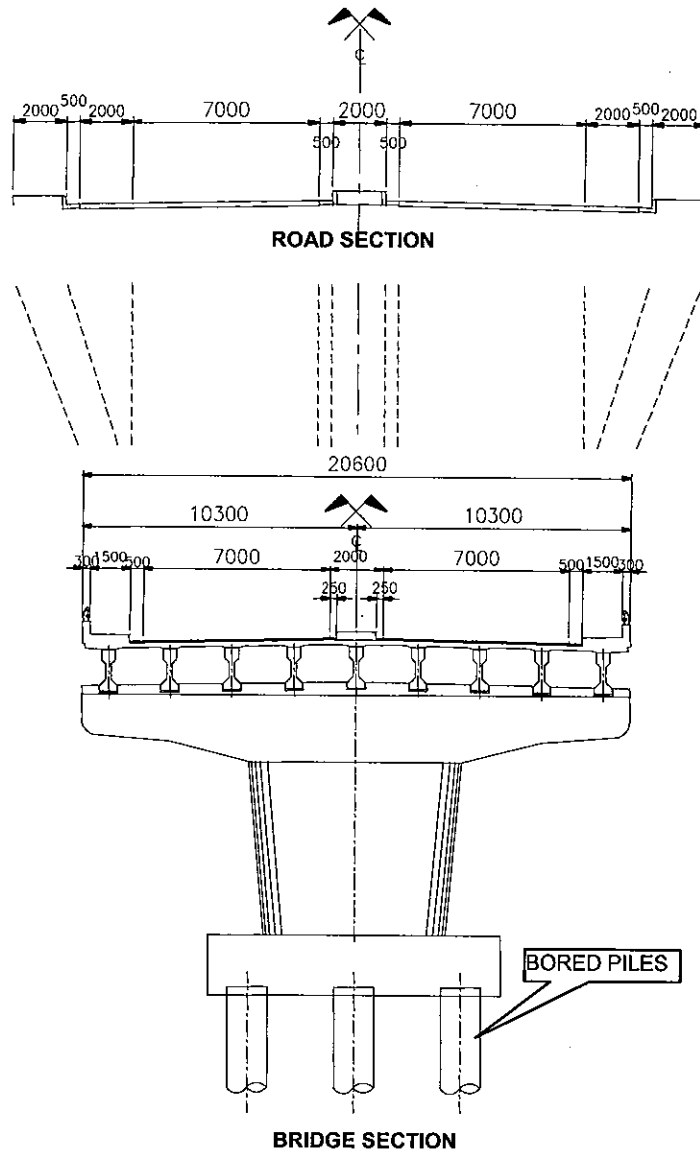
TYPICAL BRIDGE SECTION
